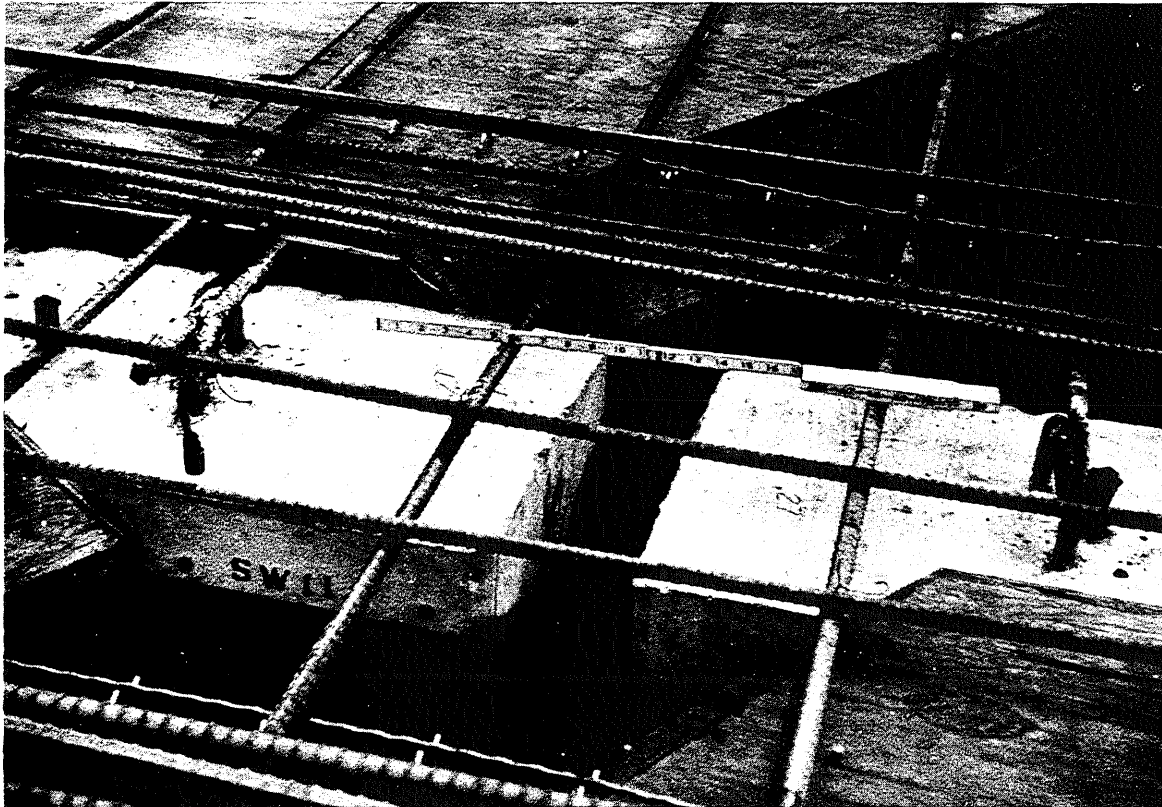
FORMWORK OVER INTERIOR PIER
